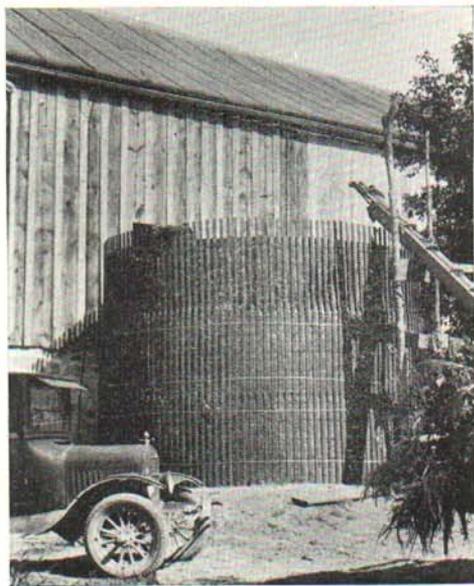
A well built crib silo, showing details of construction. (Courtesy of American Lumberman.)
